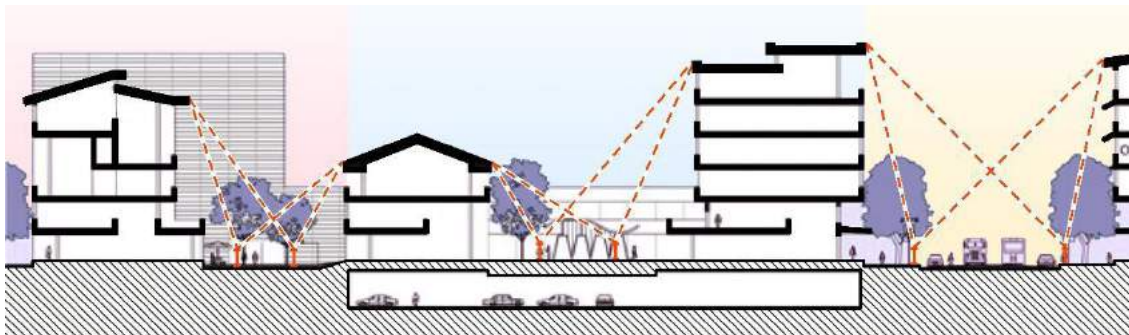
University Road and Weide Road between neighborhood inside courtyard building section
